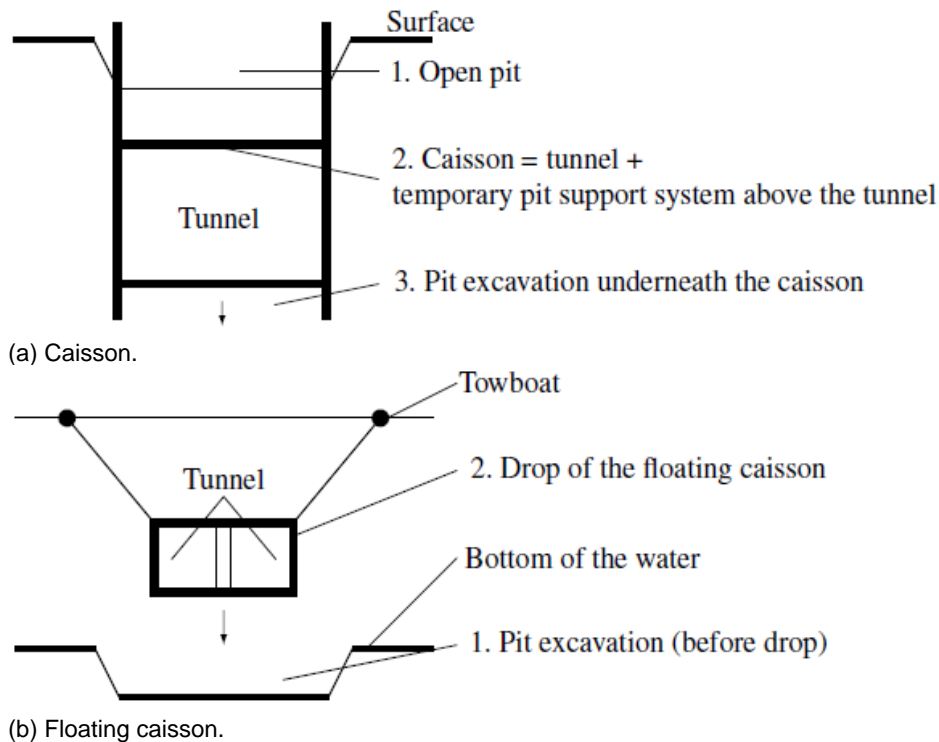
Installation of a tunnel with the caisson (a) and the floating caisson (b) technique.
